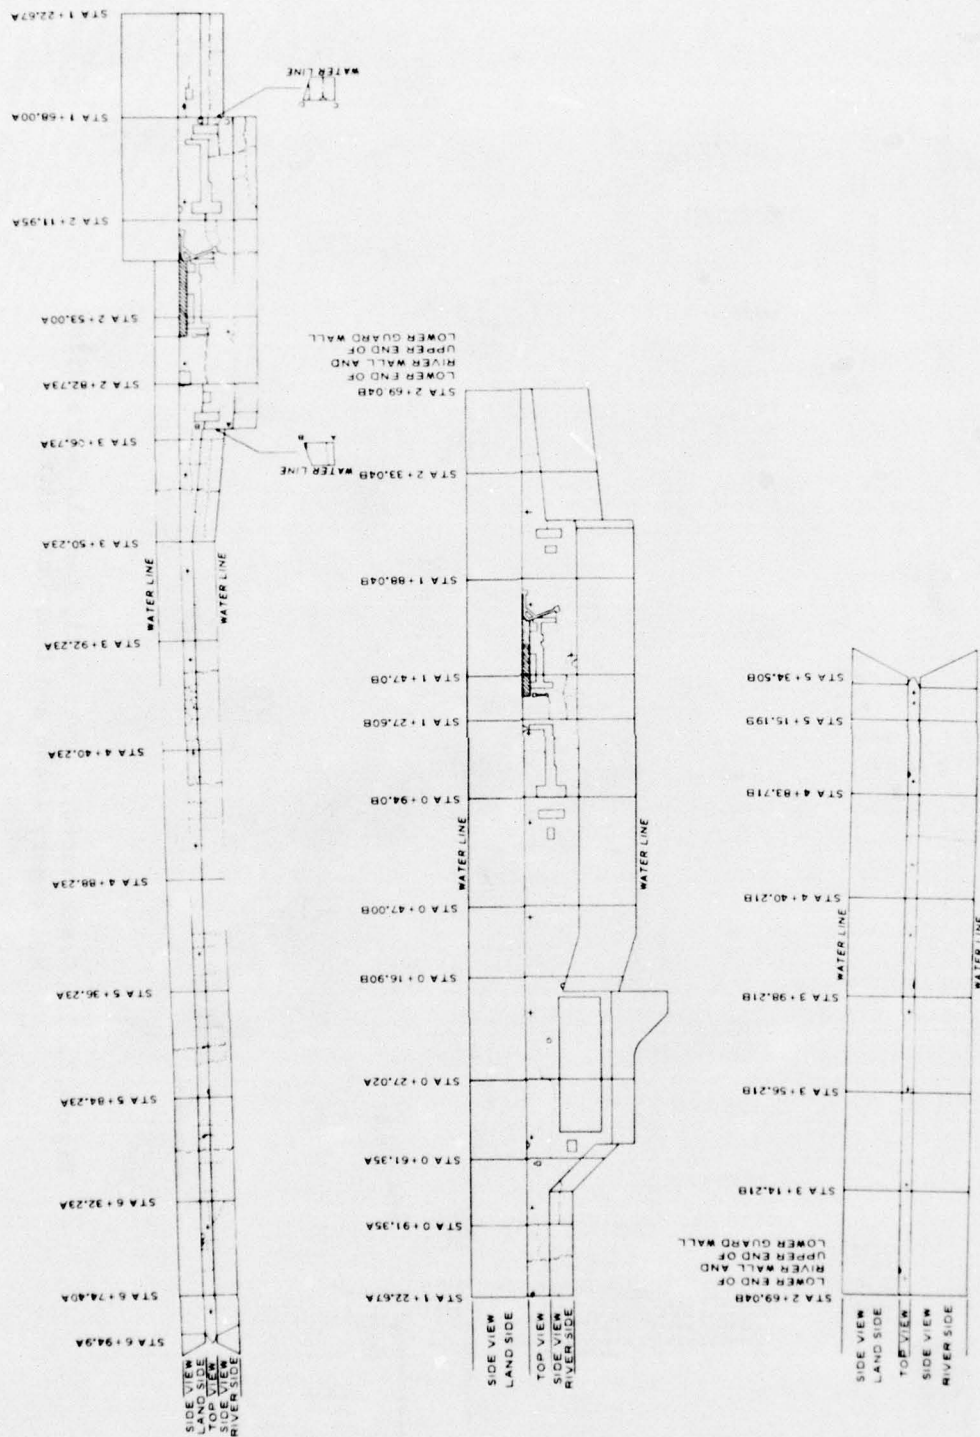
Crack survey, river and guard walls, Montgomery Locks and Dam, Ohio River.
